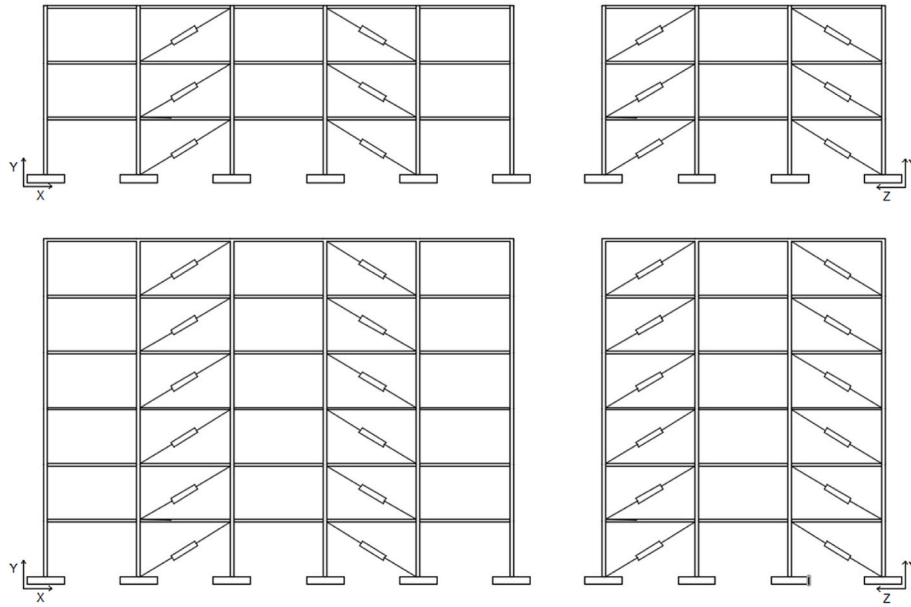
Diagonal layout of steel braces equipped with hysteretic dampers for case-study buildings.
